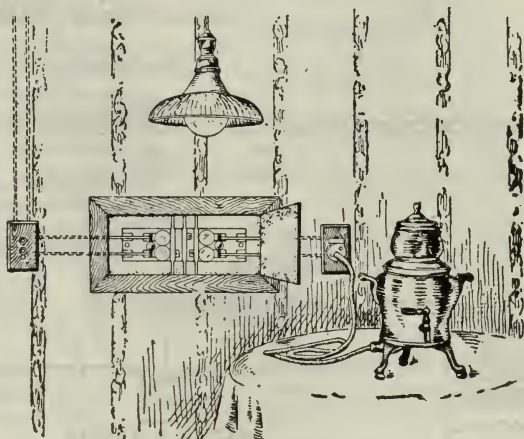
,422.—Extra receptacle for electric heating purposes. It should be carefully determined whether the wiring be of large enough size to carry the maximum current without overheating. See Underwriters' rules.
